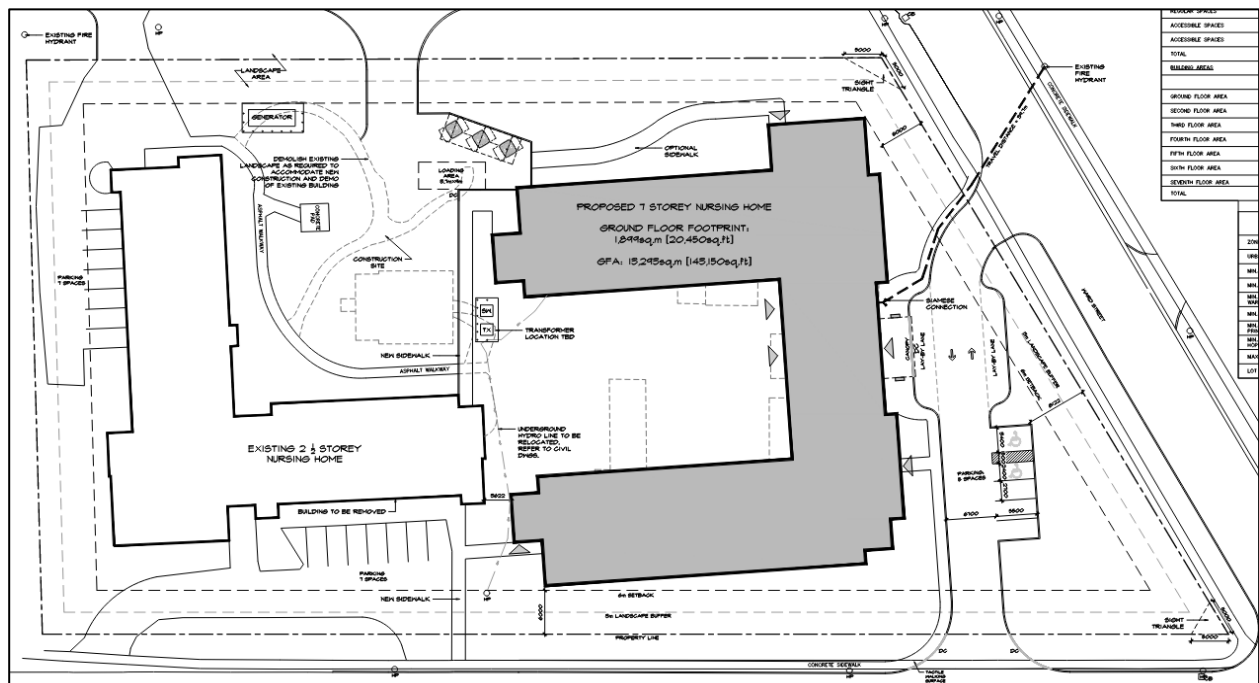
Excerpt of Interim Site Plan for 65 Ward Street prepared by SJL Architect Inc
